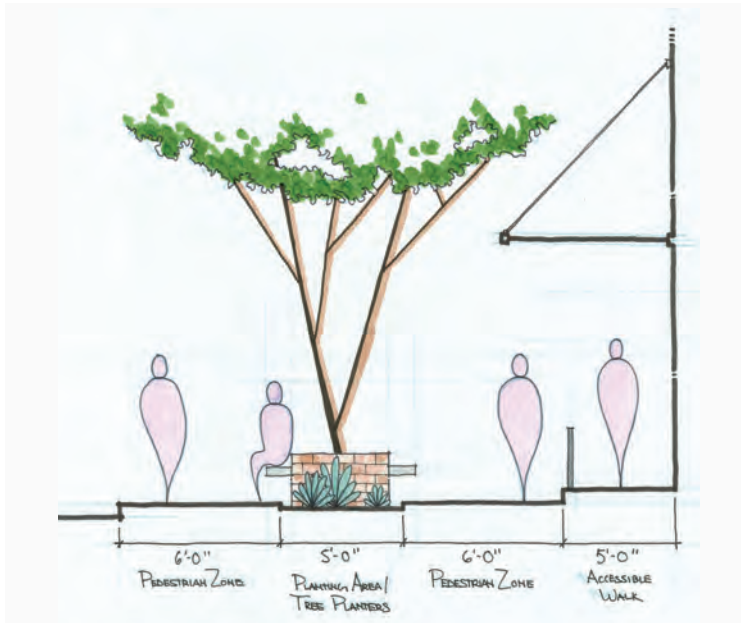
Exhibit M LAFAYETTE STREET 'CONCEPT C' SECTIONS (ORIGINAL & ALTERNATIVE)
